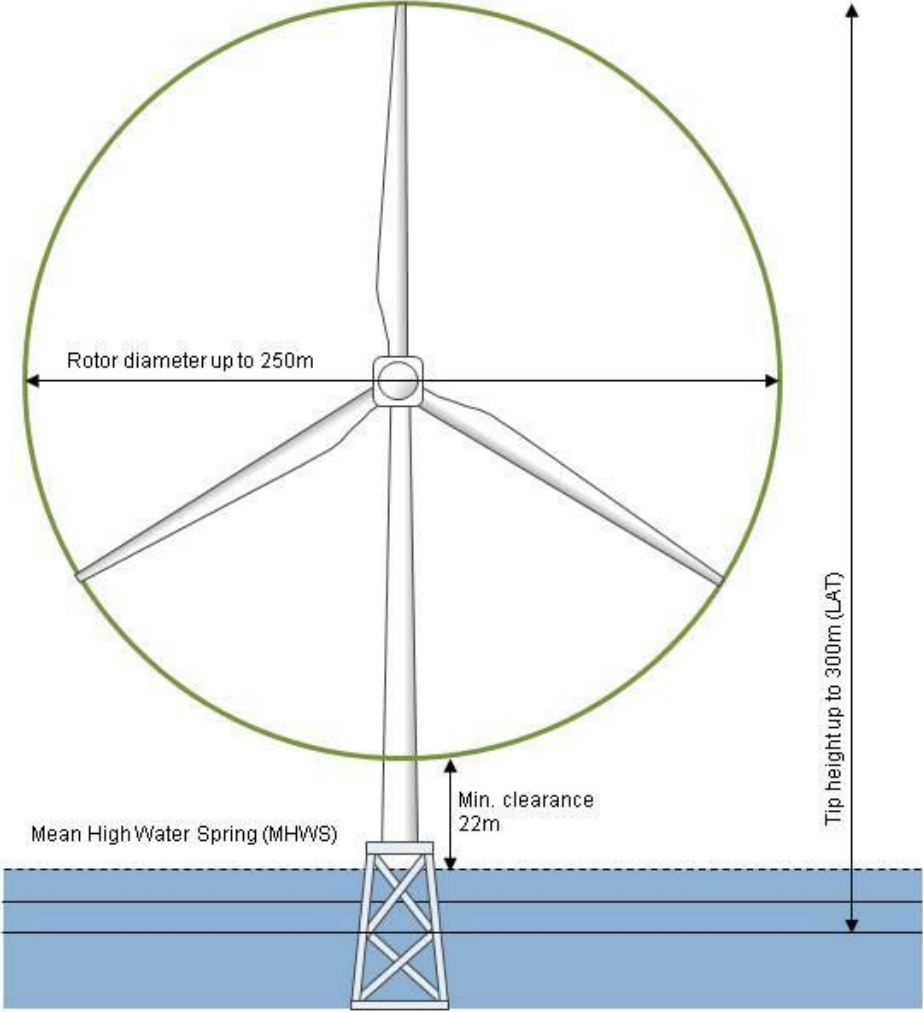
Example of a wind turbine to be used in the East Anglia ONE North windfarm site
